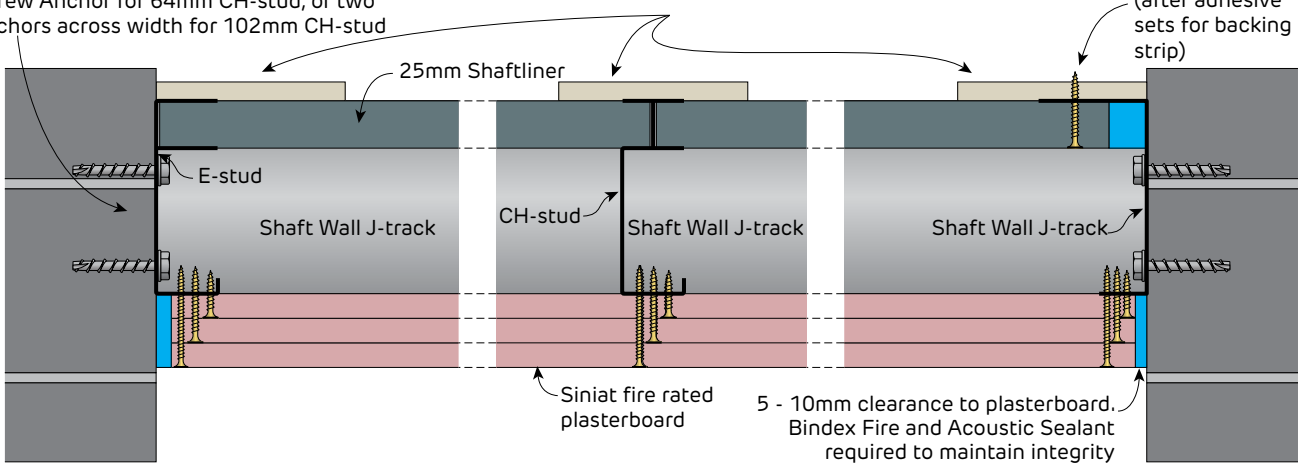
Stud Bulkhead Using Shaft Wall Ceiling
